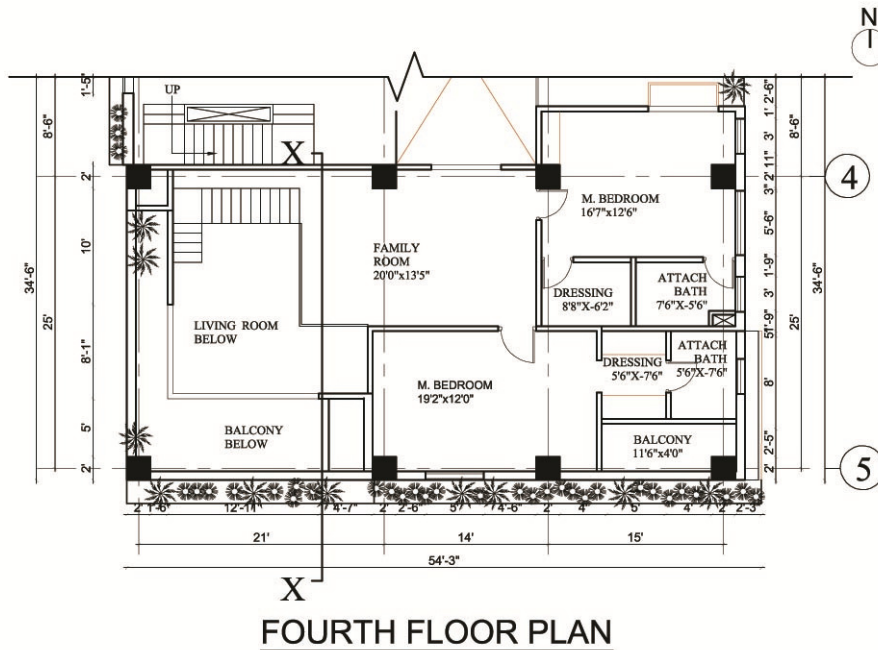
Plan of double height living room of 4-bedroom apartment
